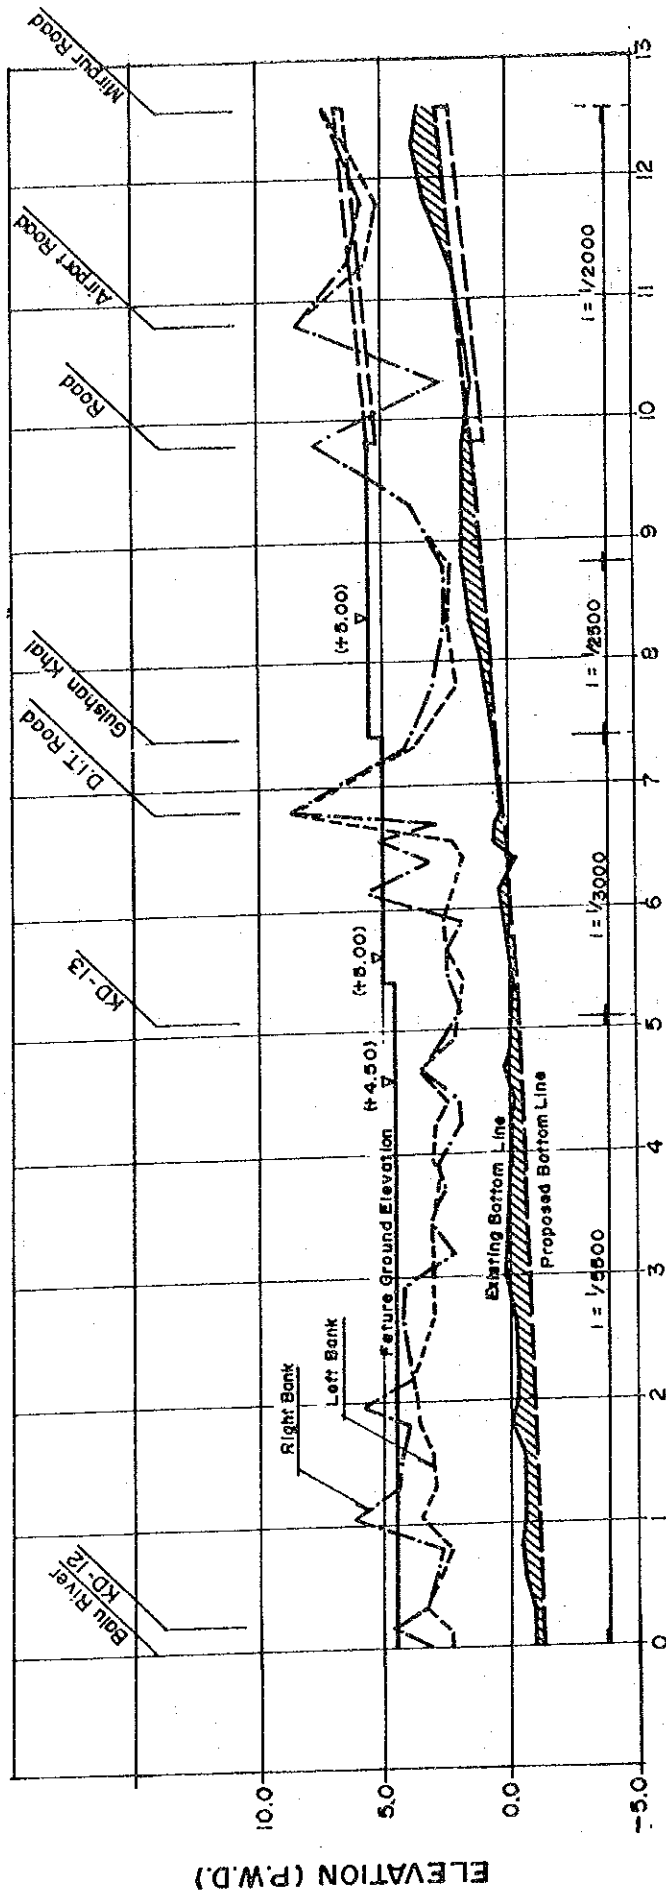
(2) PROPOSED LONGITUDINAL AND CROSS SECTIONS (KD-5)
